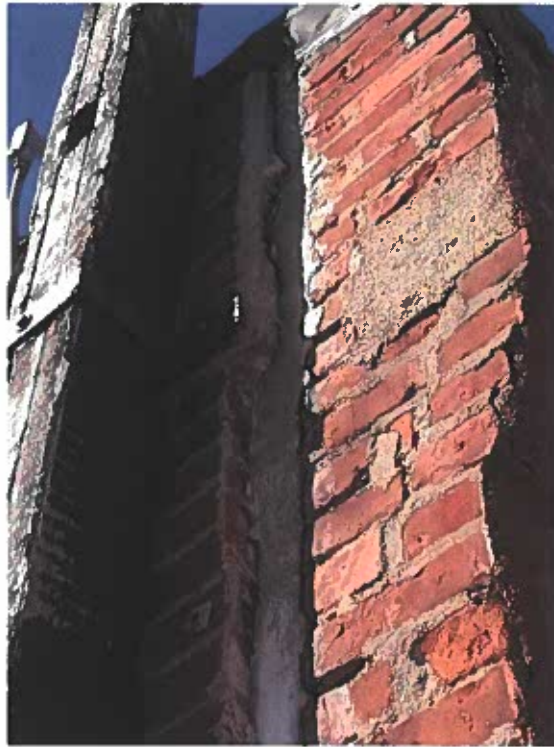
Masonry wall pulling away from the back of the structure approximately 2”.
